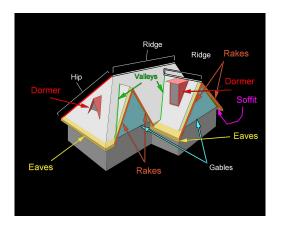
https://en.wikipedia.org/wiki/Roof#/
